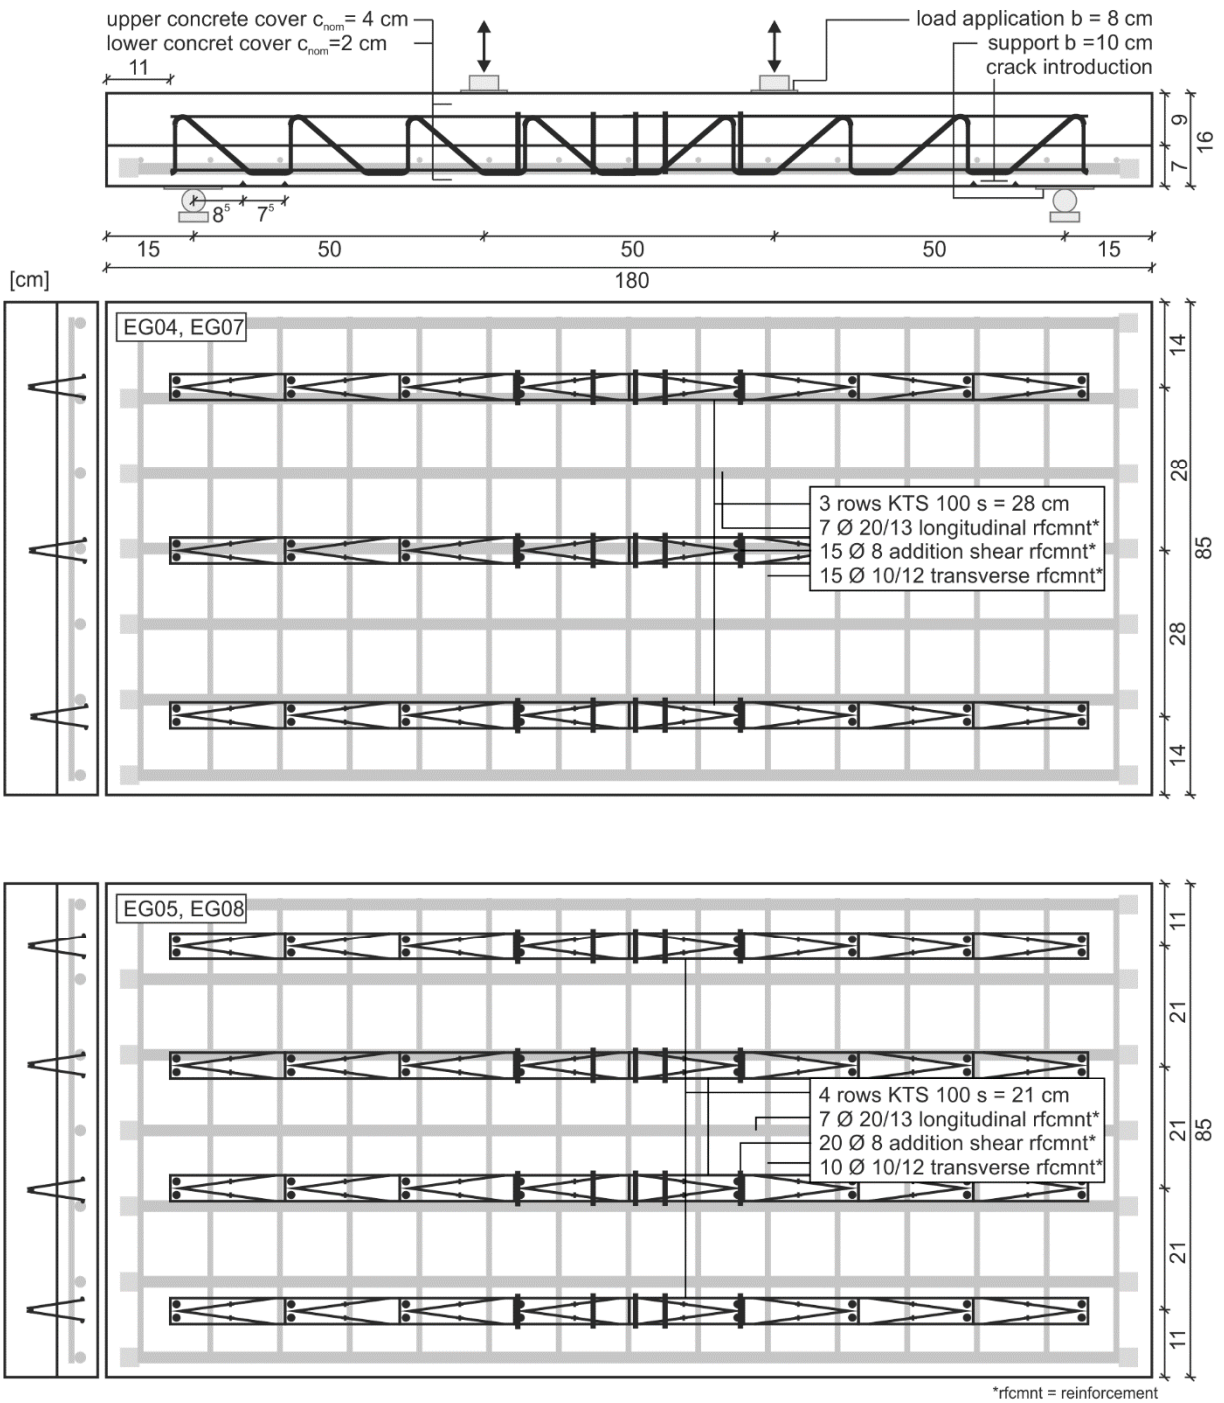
Reinforcement and formwork detail of specimens EG04 and EG07 as well as EG05 and EG08
